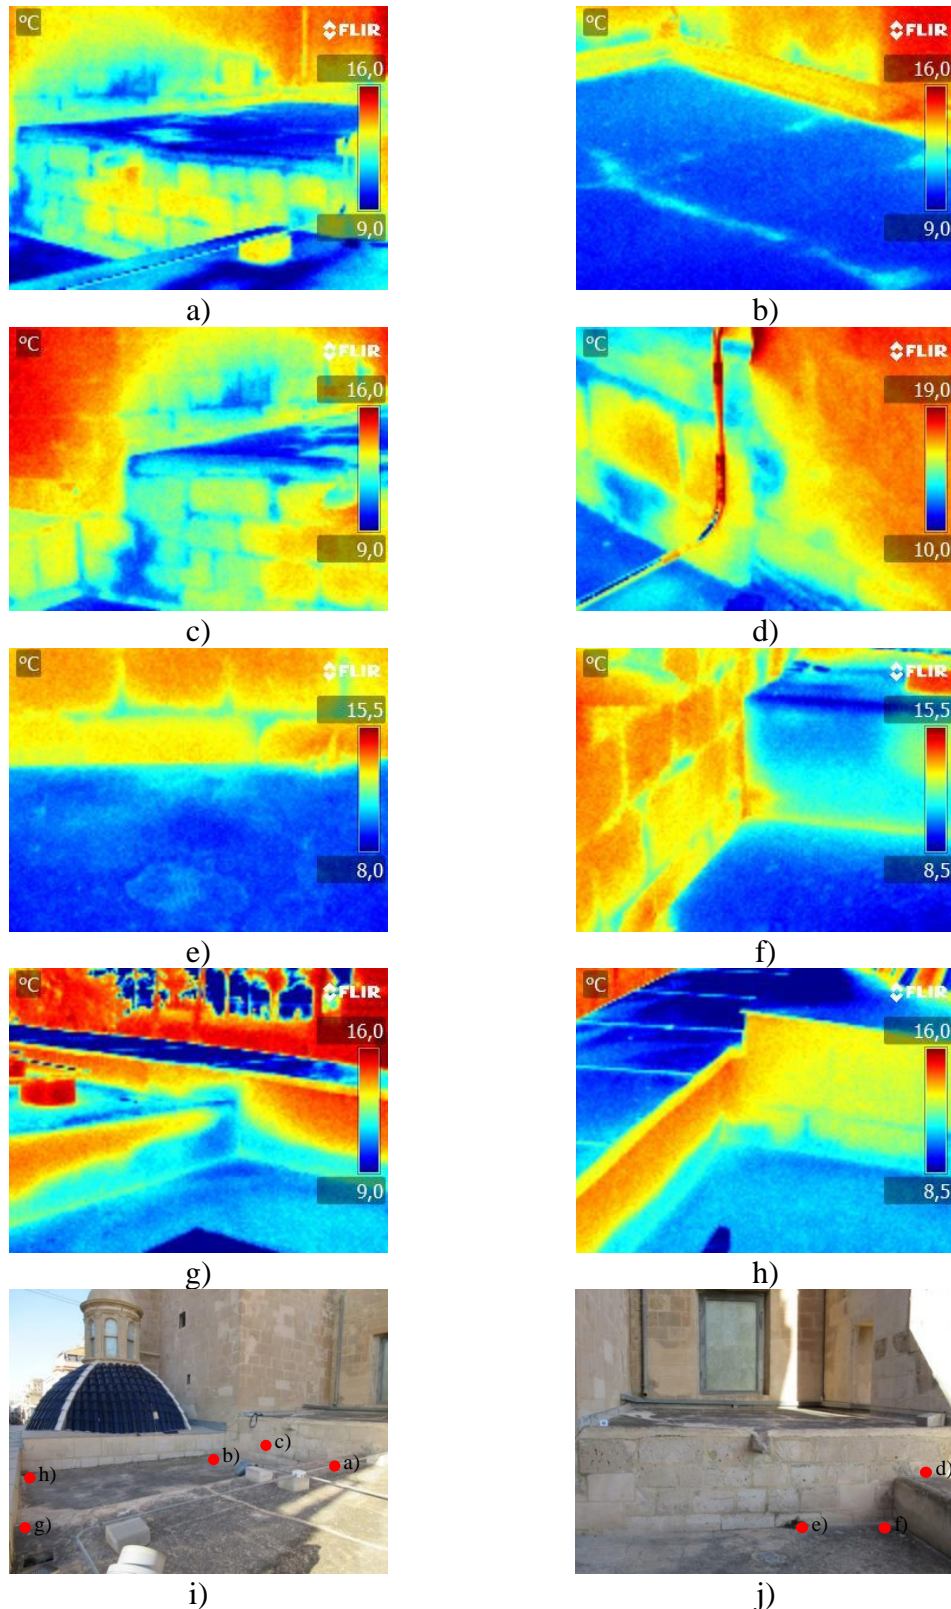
Thermography of roof 1: a) General view of the upper area, b) Detail of the installations gutter, c) Moisture in vertical facing and corner of parapet, filtration through masonry joints, d) Lack of watertightness in parapet and buttress, e) Lower skirt and vertical facing, f) Lateral connection of parapet skirt, g) and h) Capillarity, i) and j) location of the thermographs. The red dots indicate the location of the thermography in the associated image.
